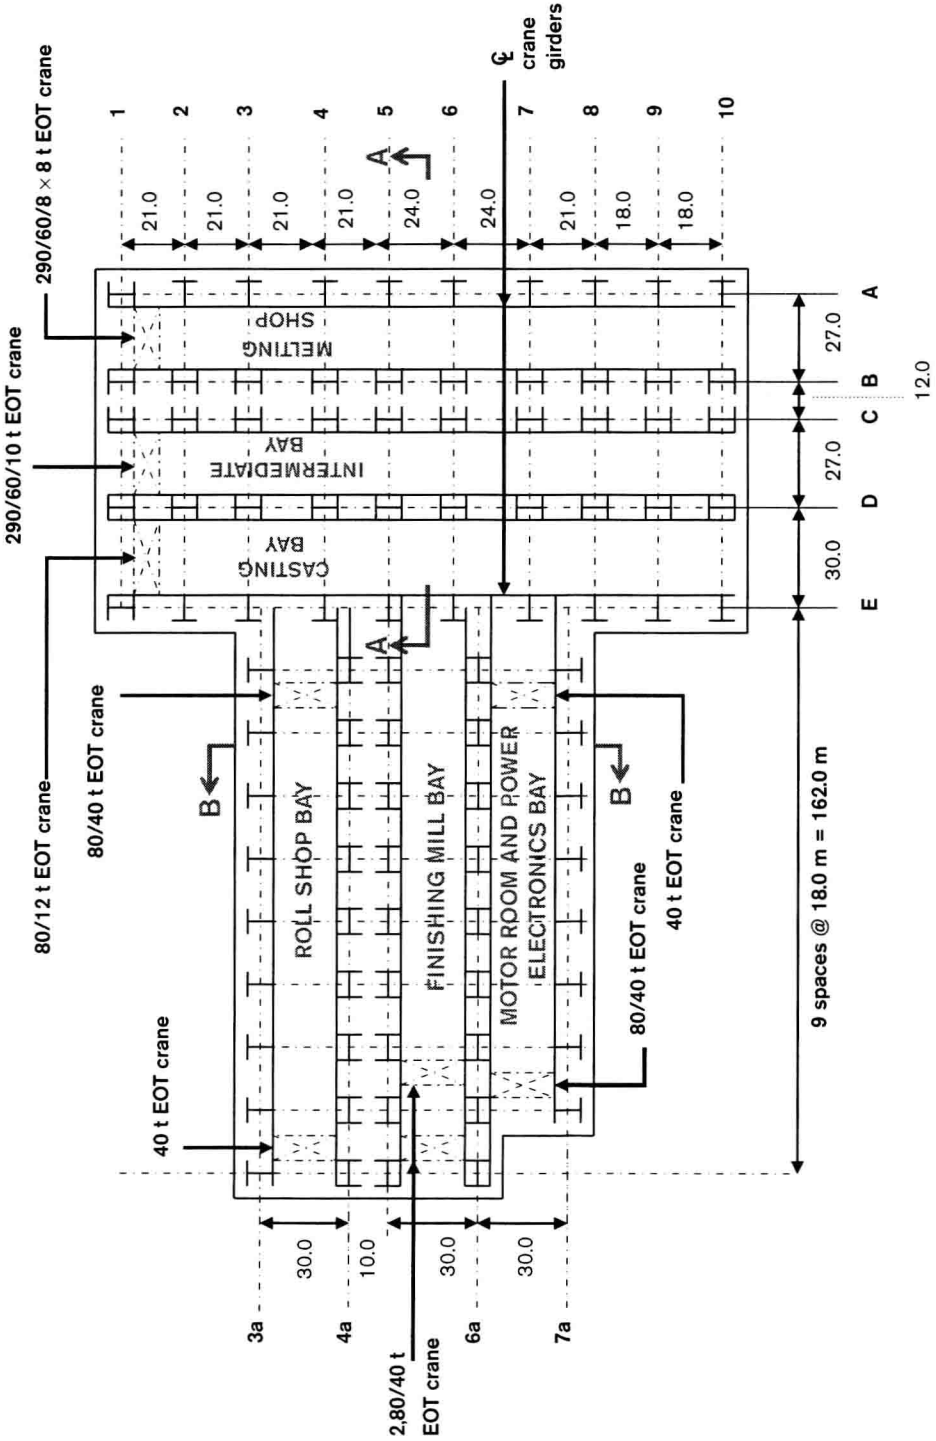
Plan at crane girder level (showing layout of columns and cranes)
